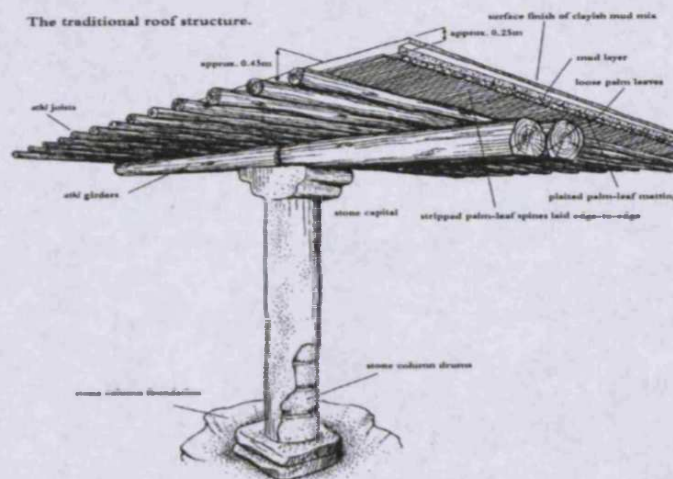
Roof details in mud buildings. Source: William Facey ⁽⁵⁻¹⁴⁾.
